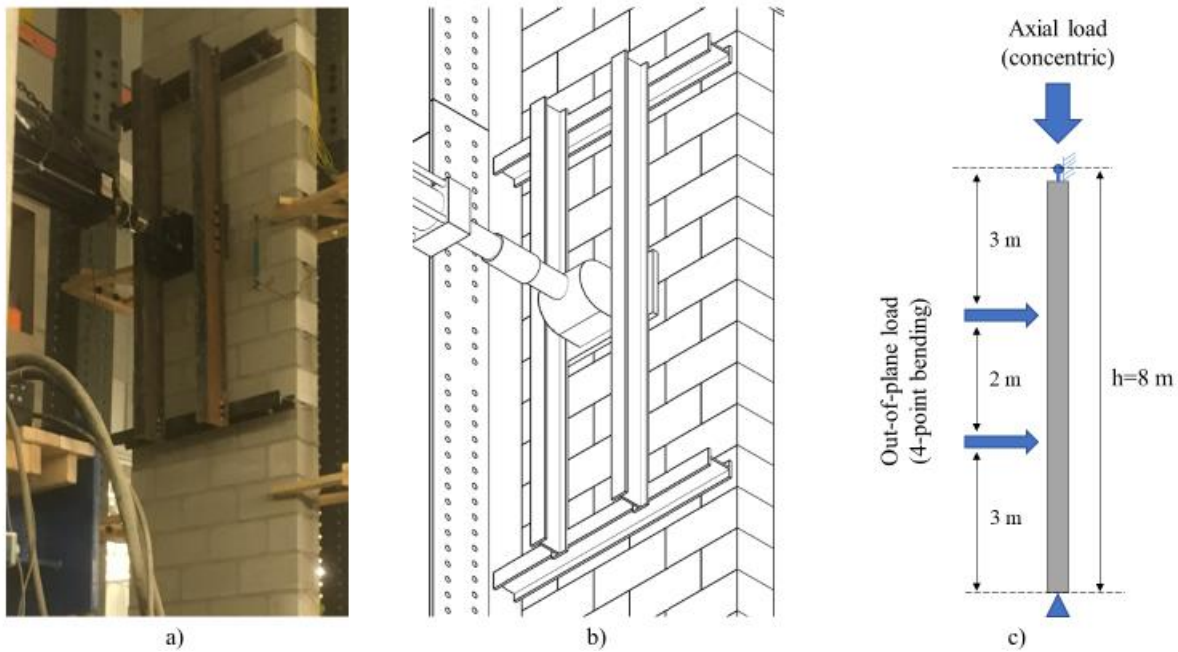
Wall loading configuration: a) photograph of spreader beams; b) computer aided rendering of spreader beams; c) conceptual loading condition
